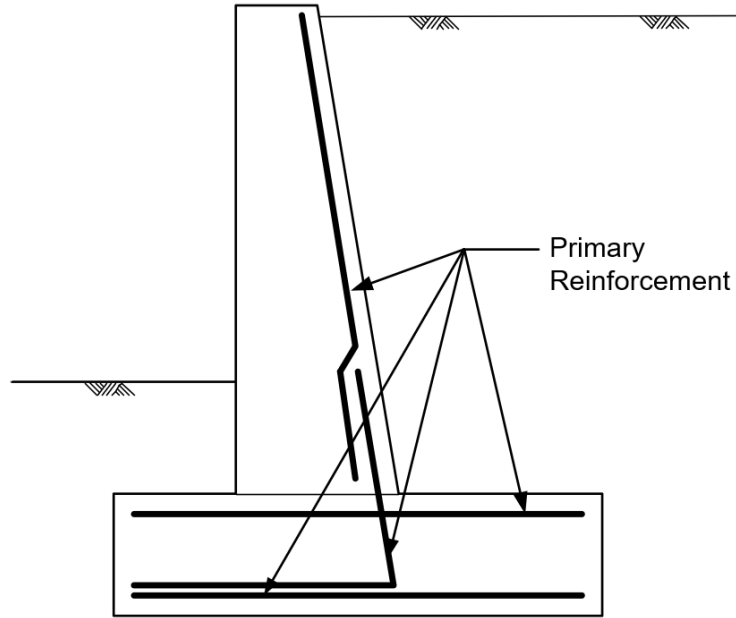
Primary Reinforcement in Concrete Cantilever Wingwall
